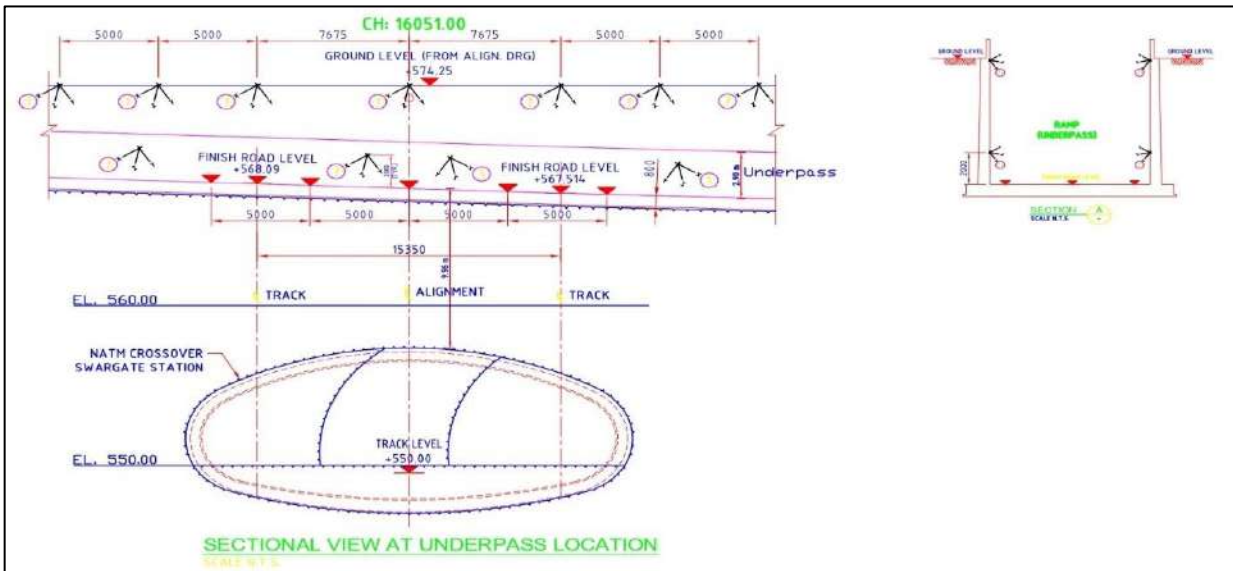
Cross-section of NATM tunnel Vs underpass at Swargate
